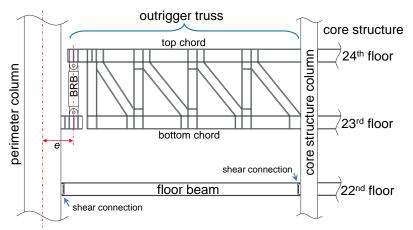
Enlargement of the BRB-outrigger detail in the 32-story MBM model
